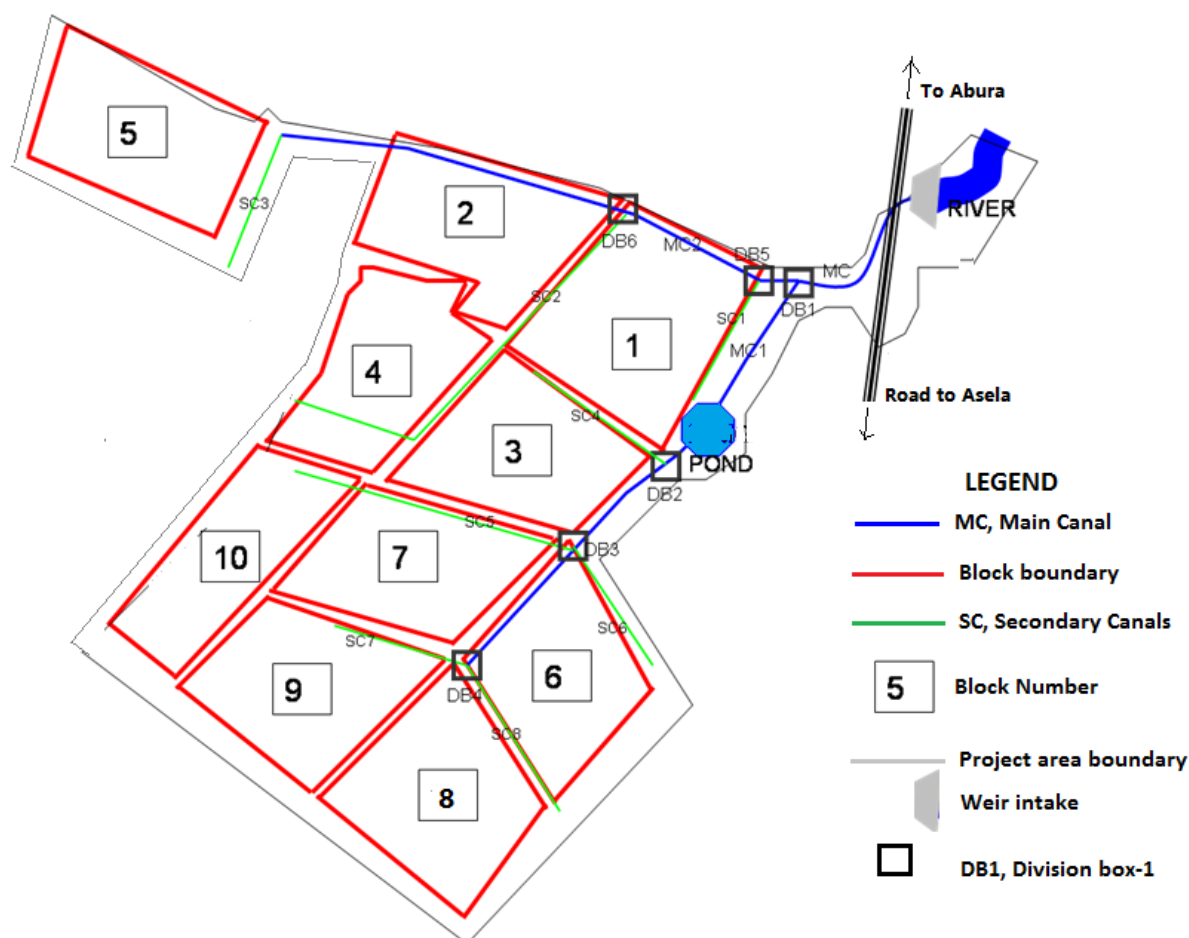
Example of as-built layout plan of scheme (Arata chufa scheme)
